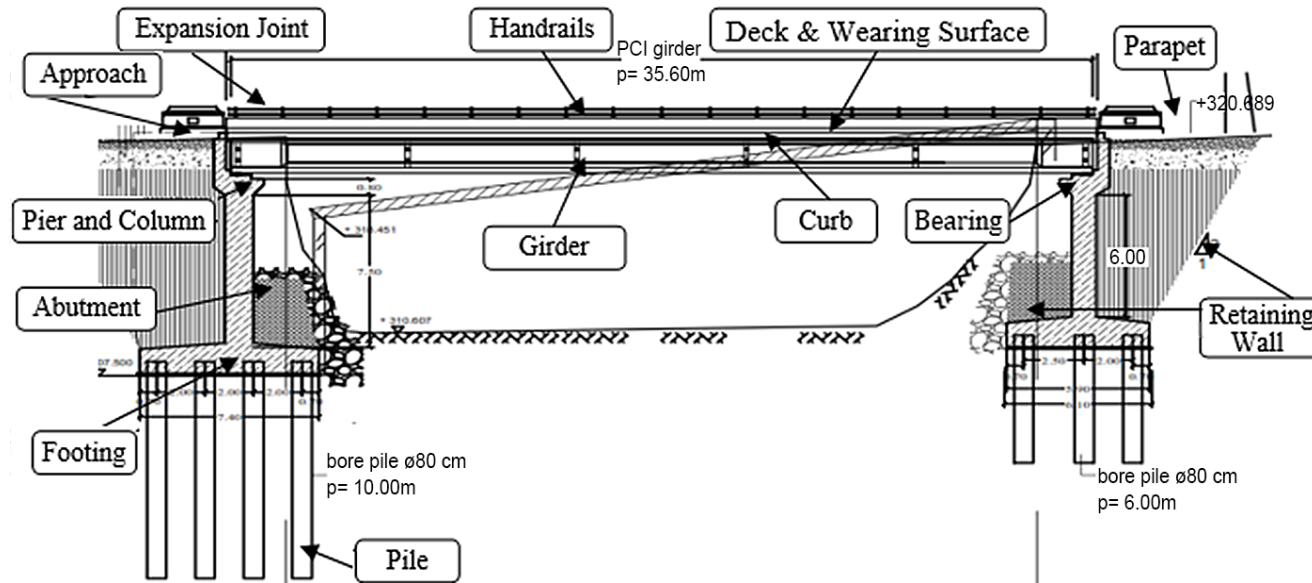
The Typical Cross Section of Concrete Bridge Structure
